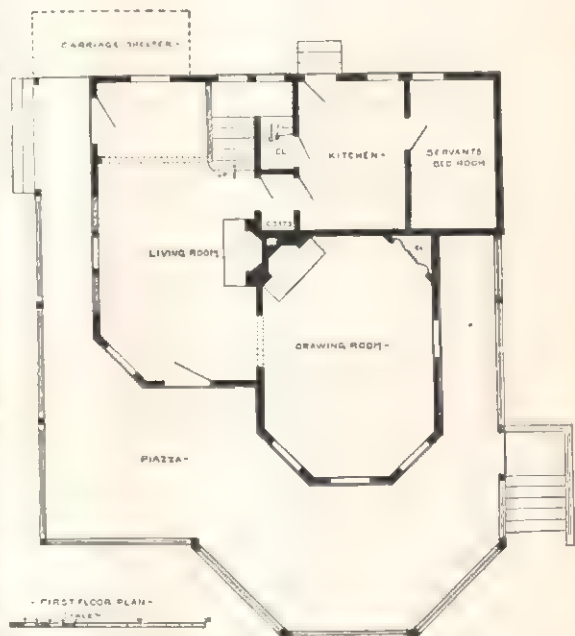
Cottage Costing about \$3,000. Stone foundation, shingled sides and roof. Designed as a Summer House by W. A. Bates.
